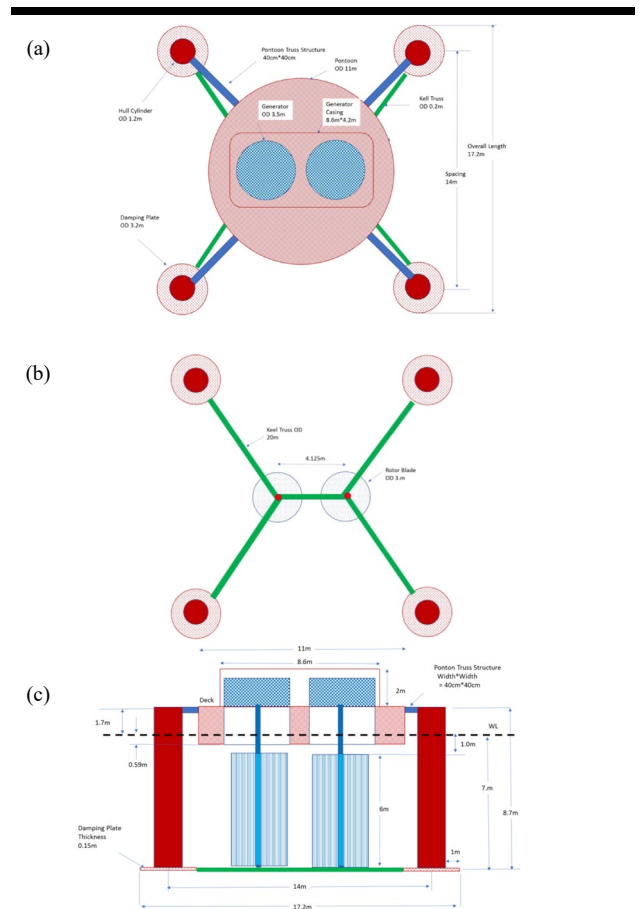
Base platform configuration (plan view at deck level (a), plan view at keel level (b), and elevation view (c)).
